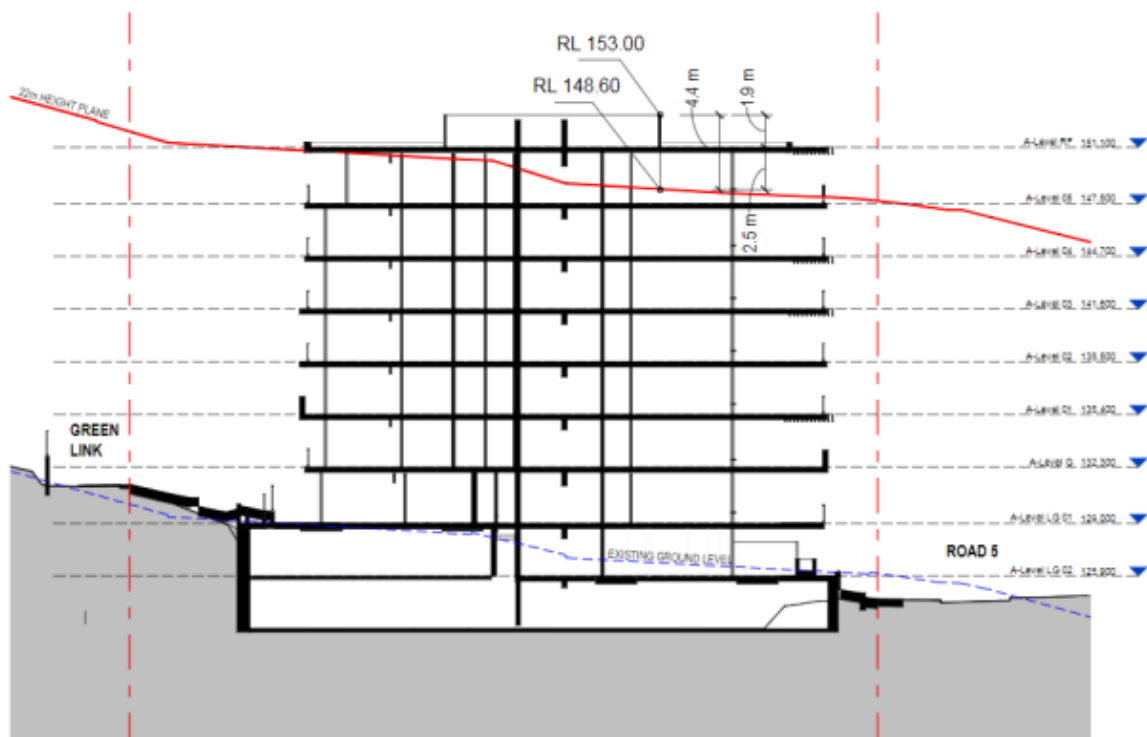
South Section of Building A showing the extent of height contravention (4.4m) (Source: Mirvac Design)
